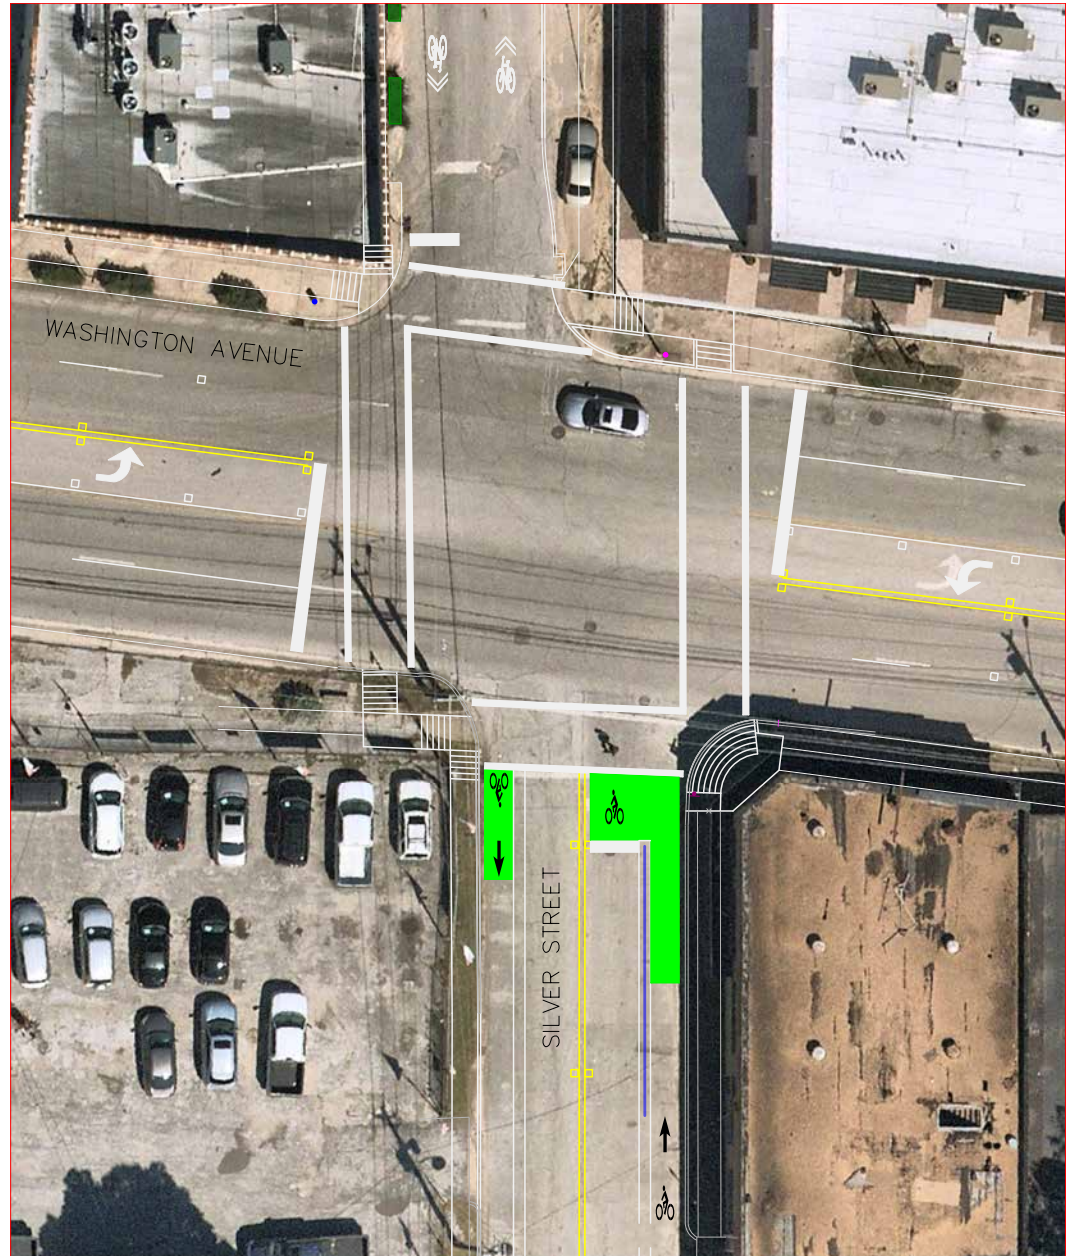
Schematic Design of Silver Street at Washington Avenue
